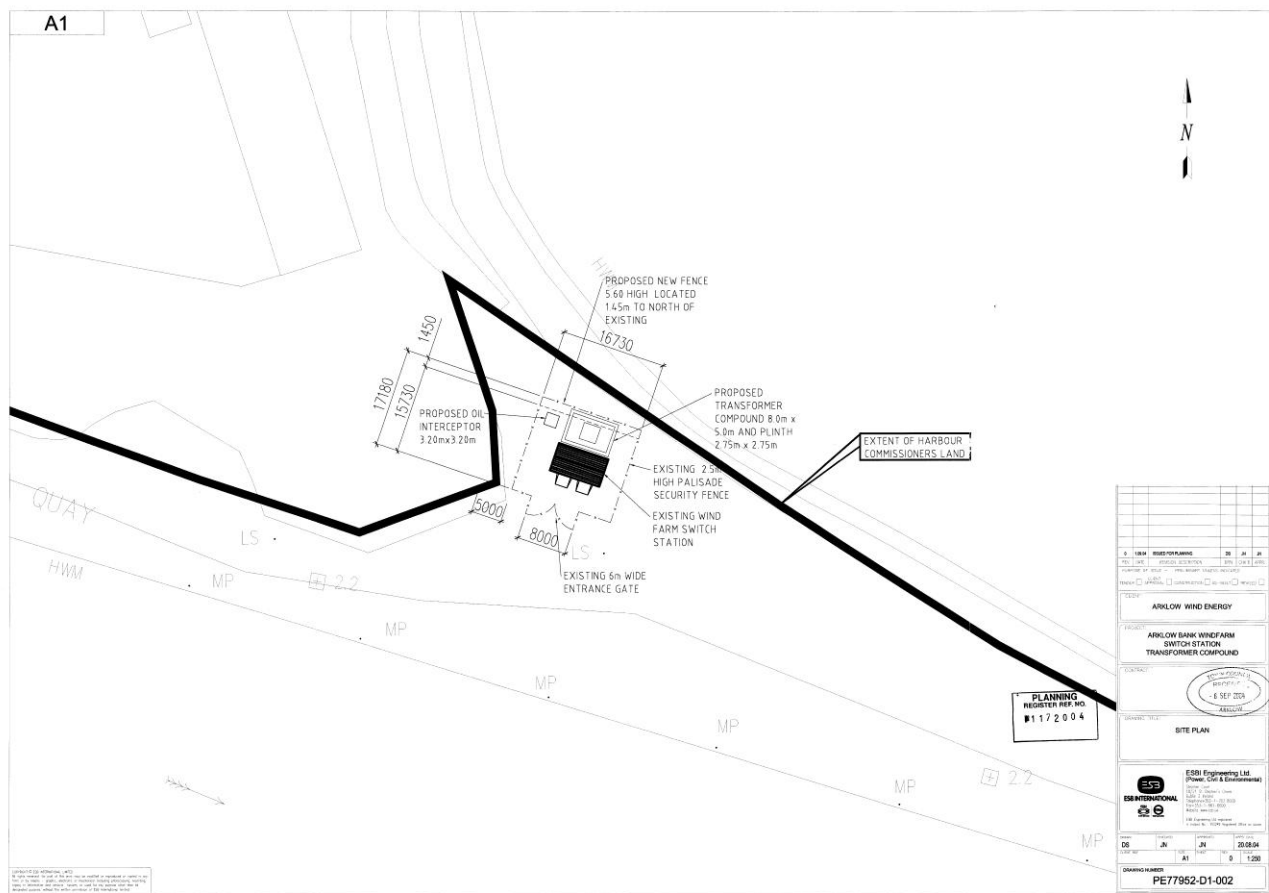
117/2004 Site Layout for Onshore Substation (Amended)
